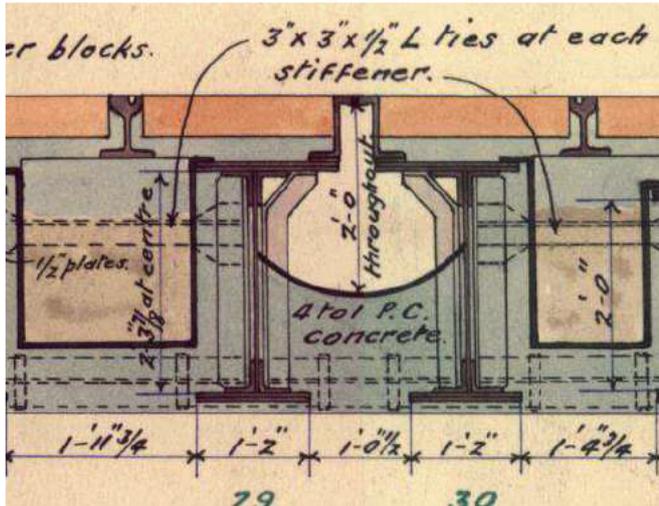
Section from North London Rly City Extension drawing – Girders 29 and 30
